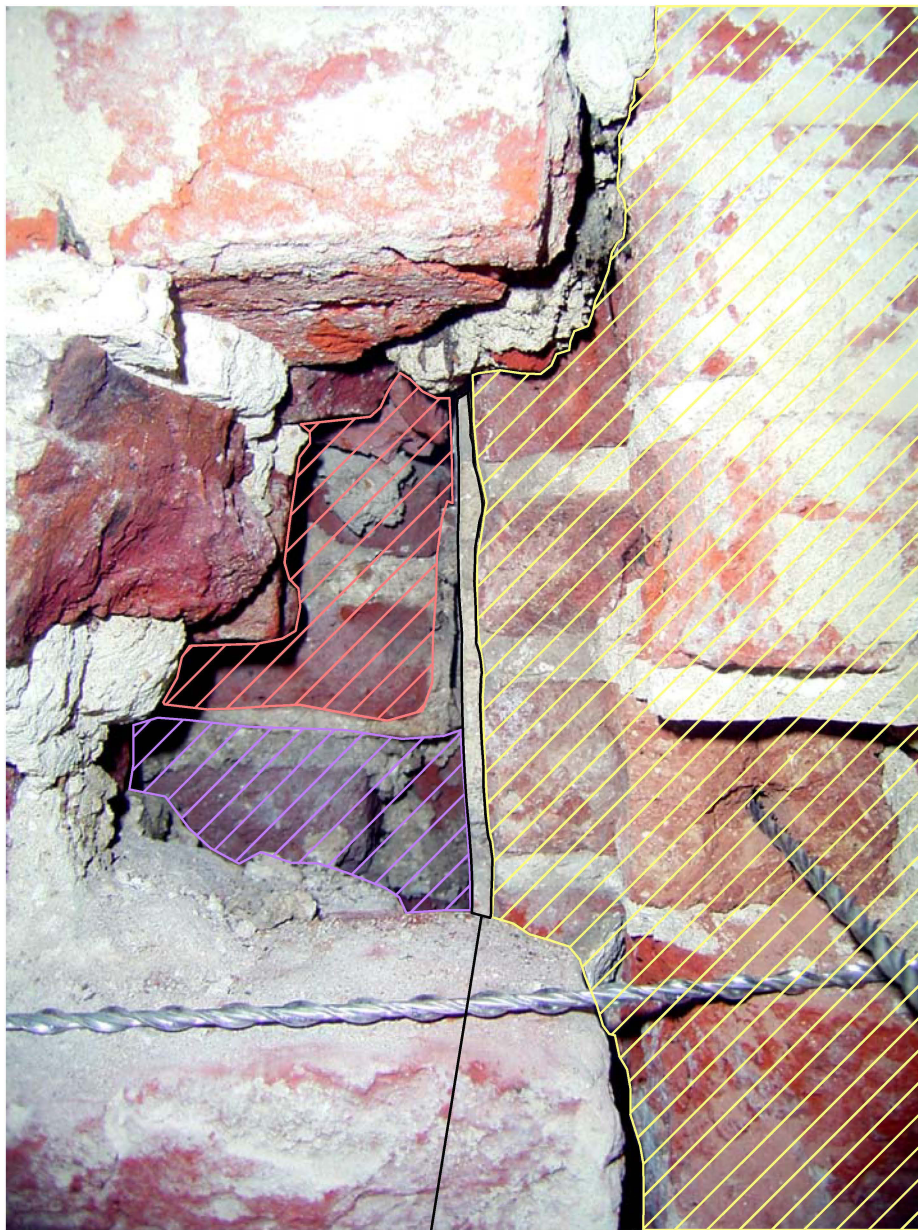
South wall, internal phased brickwork, first and second floor, showing further archaeological detail
